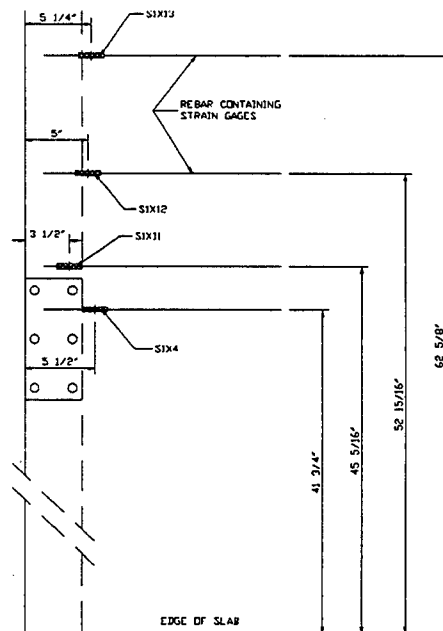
Slab Reinforcement Gage Locations, Exterior Column
